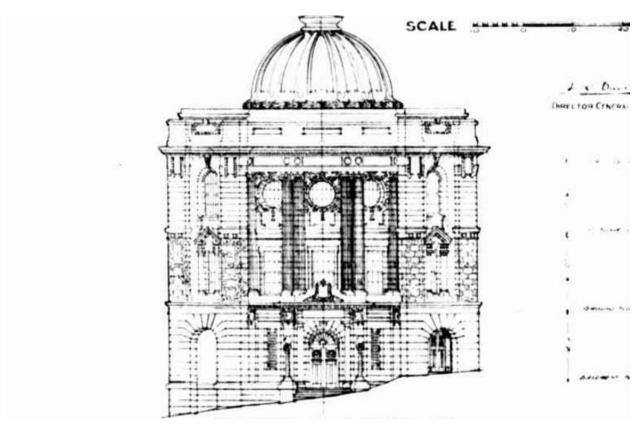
Additions to Treasury by George McRae in 1916 (Proposed elevation to corner of Bridge & Phillip St – not constructed)
